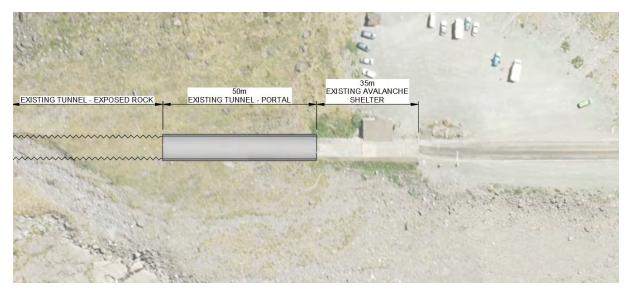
Plan showing the layout at the eastern end of the tunnel
